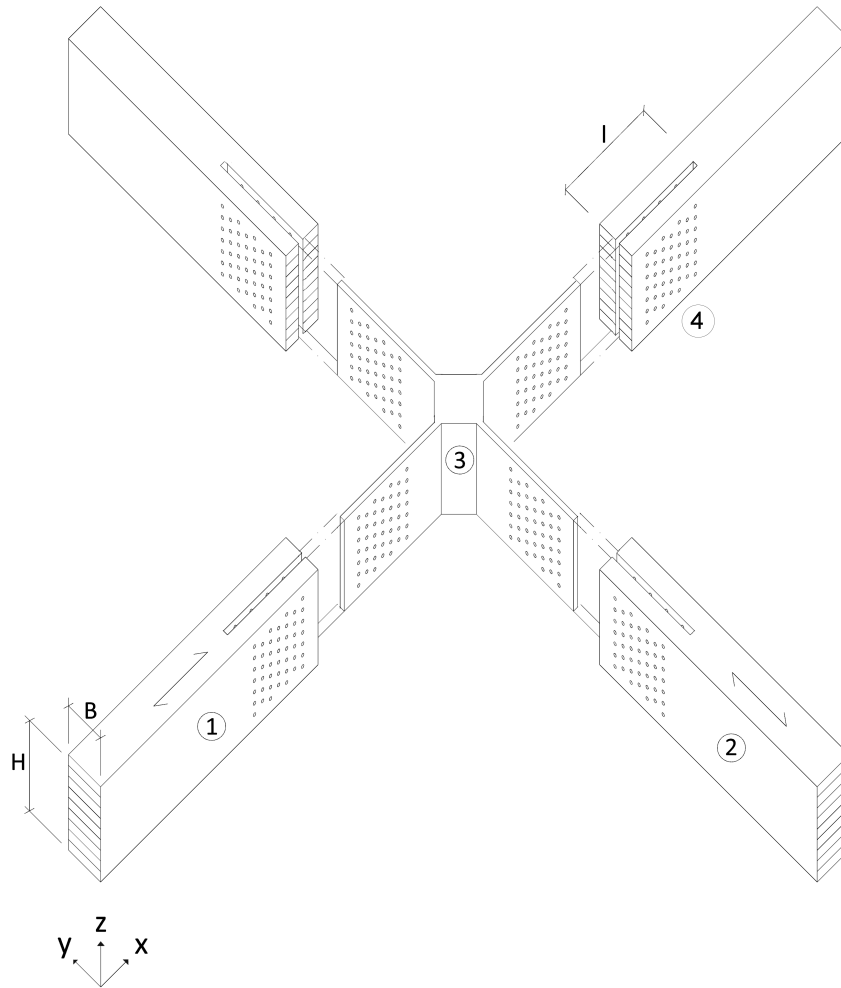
Steel node-type joint. Diagram showing the assembly and components of the joint
